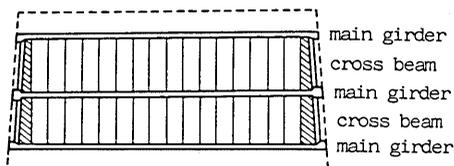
Setting of prestressed concrete panel in trapezoidal shape
